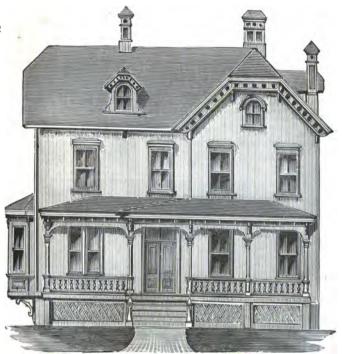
ELEVATION OF FRONT OF HOUSE.
